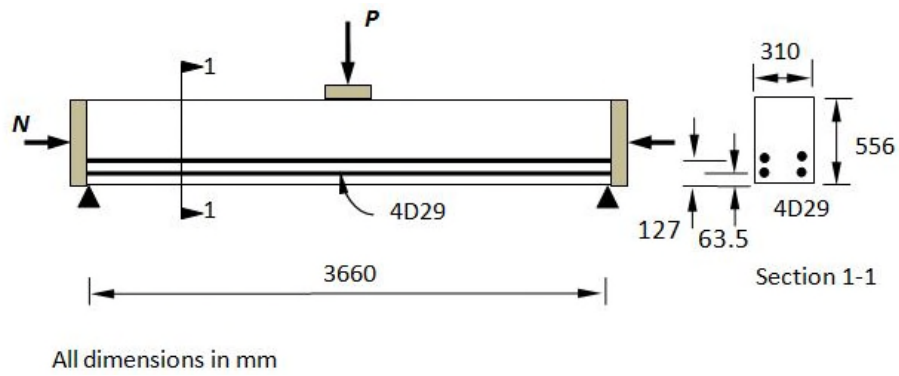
Geometric characteristics and longitudinal reinforcement arrangement of beams tested
